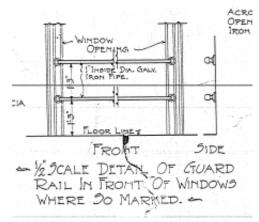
1914 drawing detail of fall protection railings at window locations within the stair corridors.
